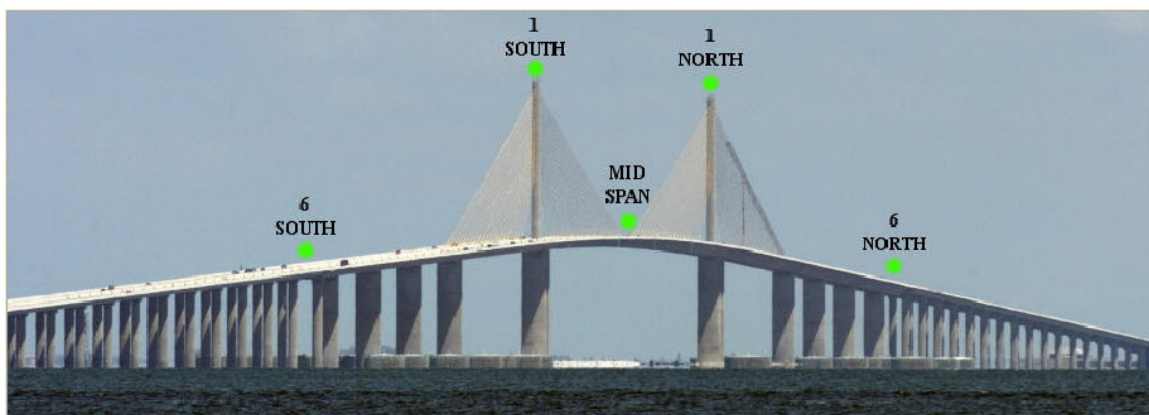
The Skyway Bridge structural health monitoring system (Courtesy of FDOT: D7)
